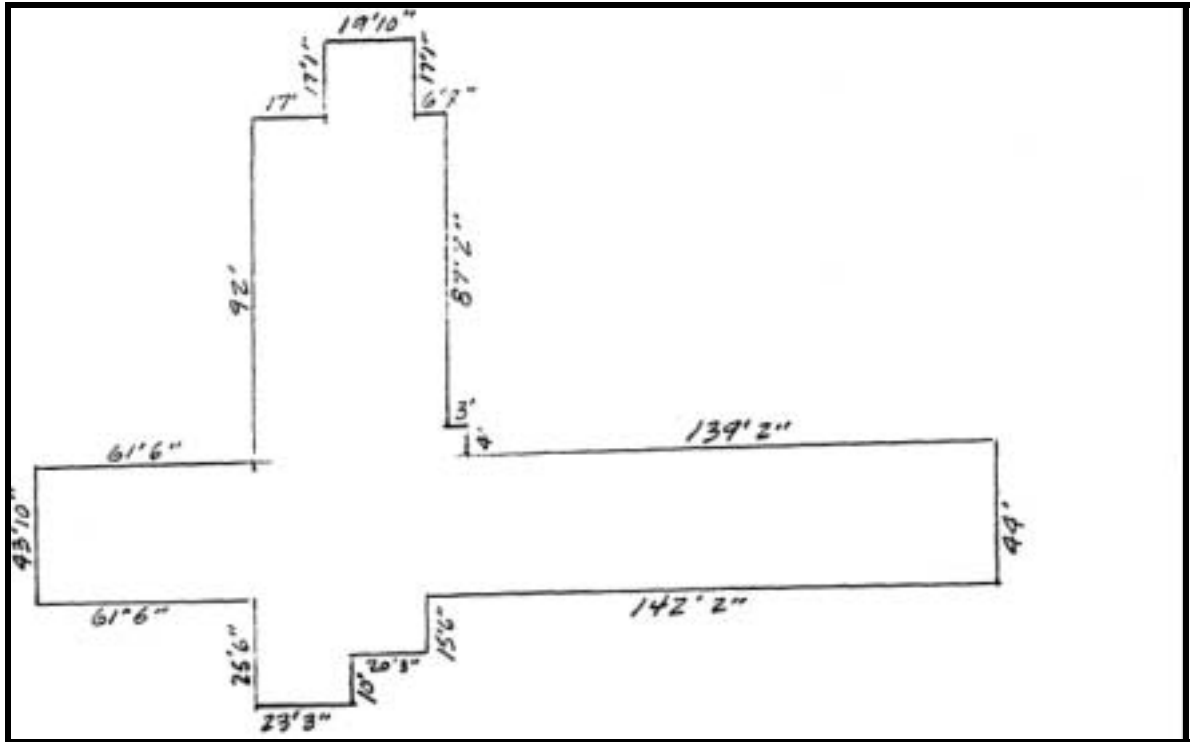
High Rise BOQ, sketch plan (ca. 1958) (Real Property, Ft. Knox).
